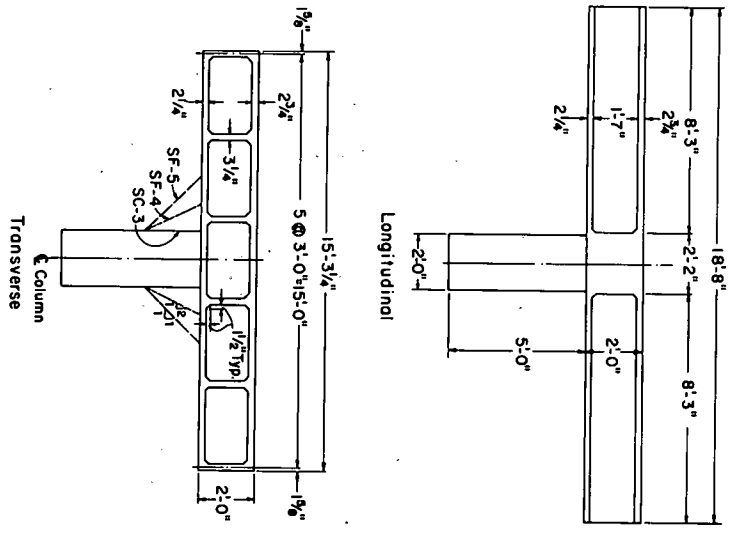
Section Details for Specimens SC-3, SF-4, and SF-5
